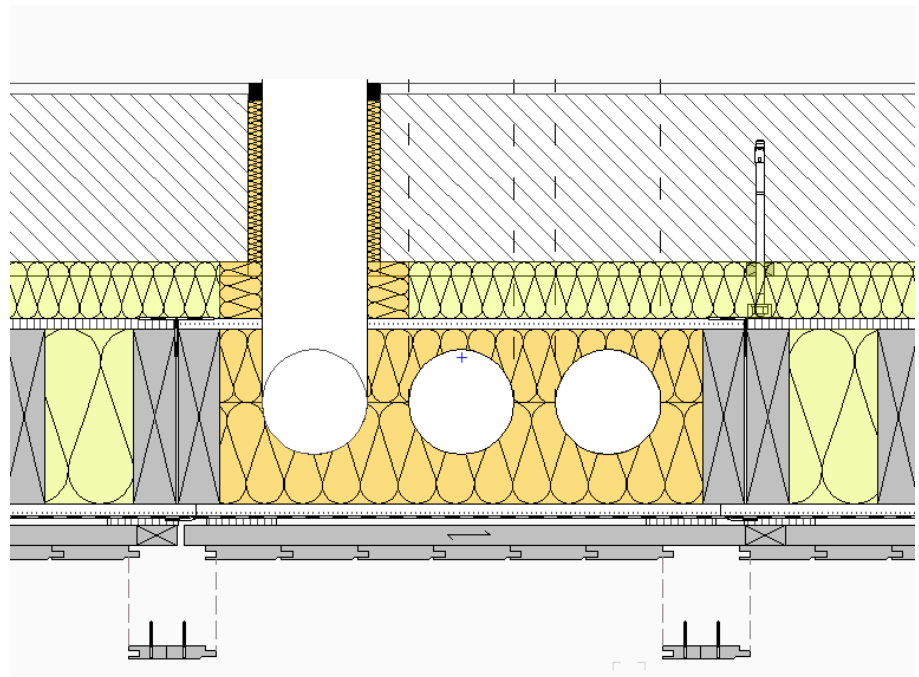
Example: Horizontal section of vertical TES module with HVAC ducts. Alternative shaft solution covered with gypsum board and precast mineral wool in lay.
